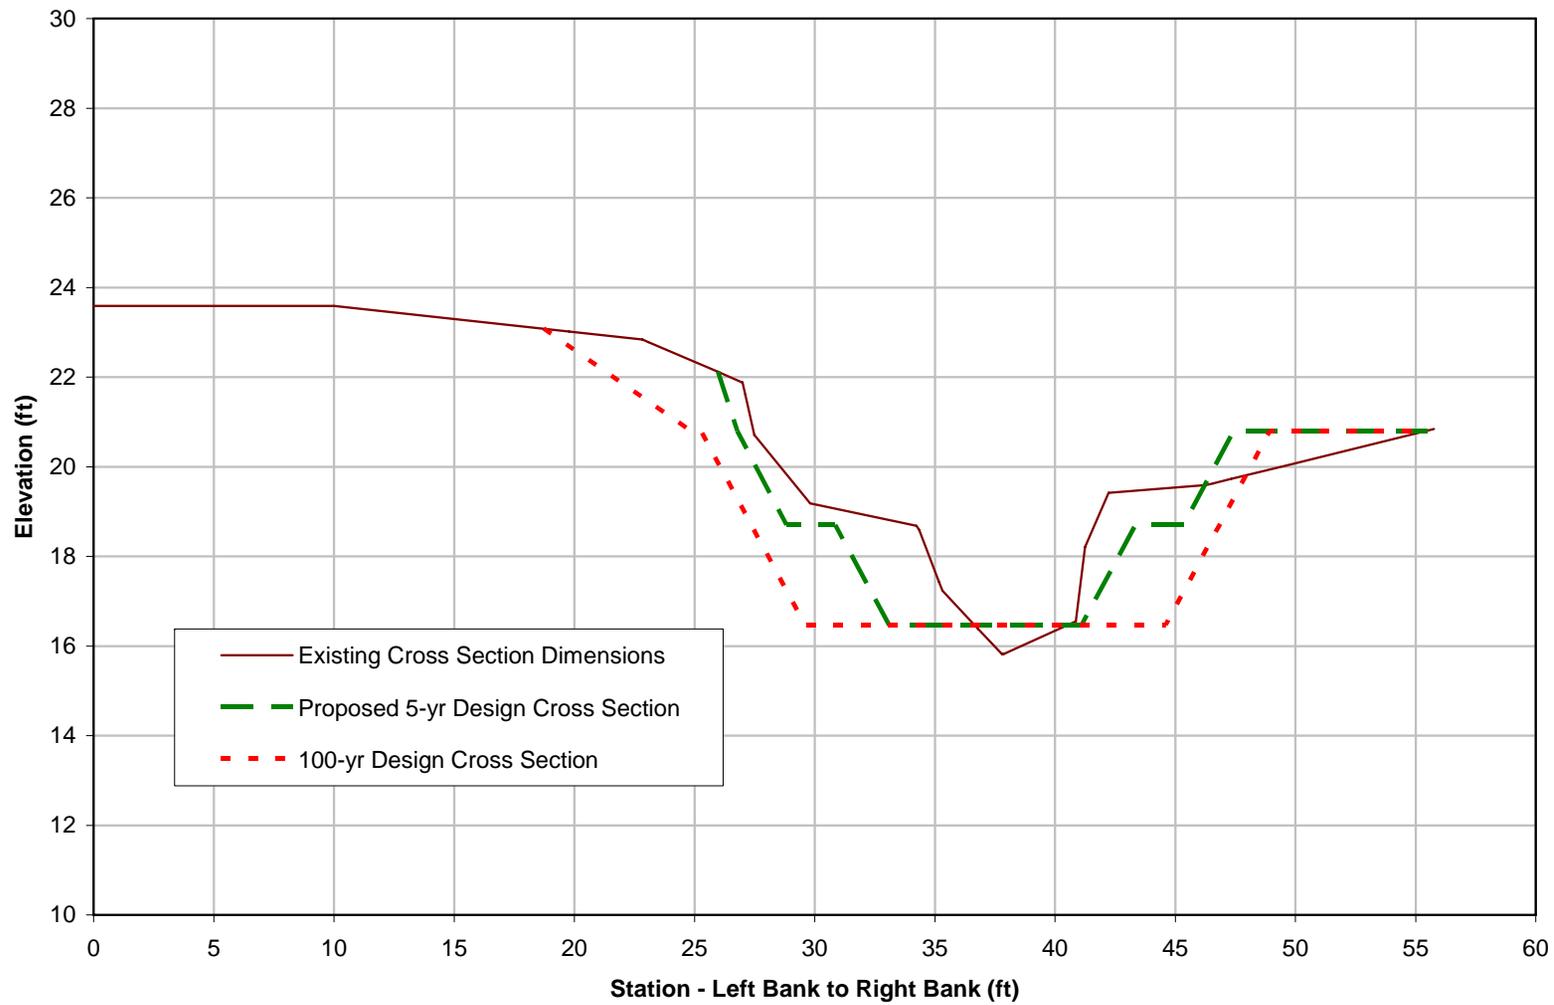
Cross section dimensions of the existing channel, the proposed 5-yr design channel, and an example cross section that would pass the 100-yr flood.
